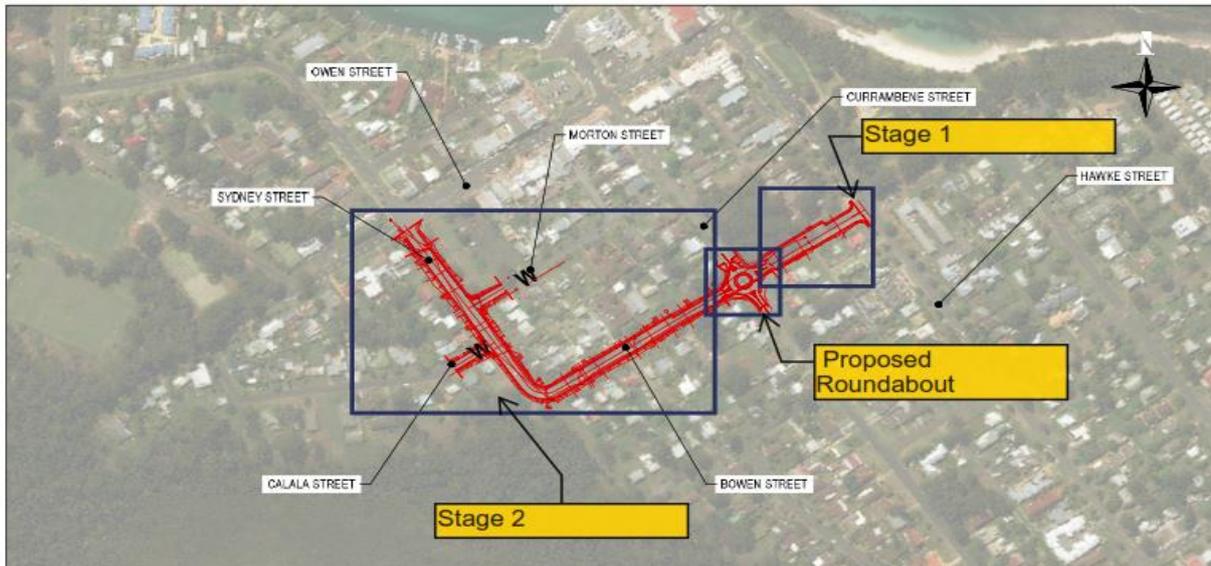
Sydney Street/Bowen Street Huskisson 2540
